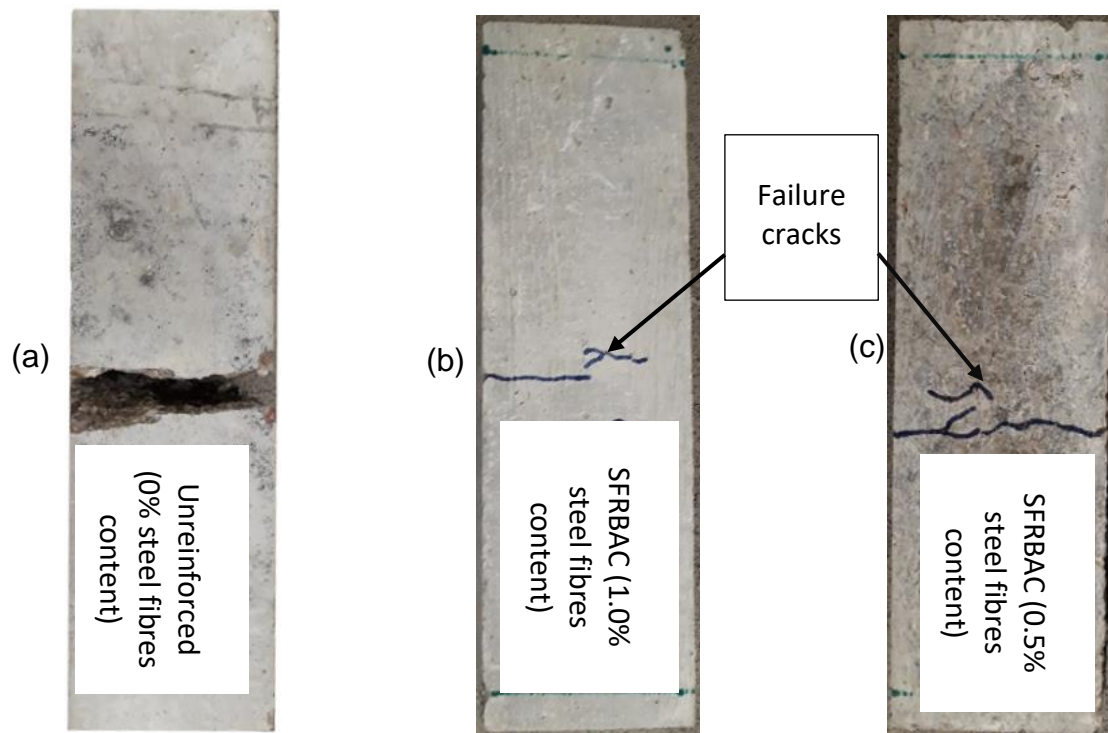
Flexural failure mode of unreinforced and steel fibre-reinforced recycled concretes.
